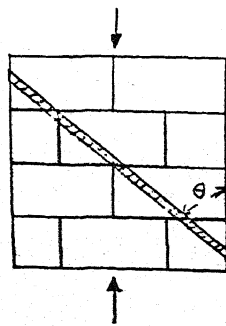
EPOXY REPAIRED SHEAR WALL SPECIMENS
